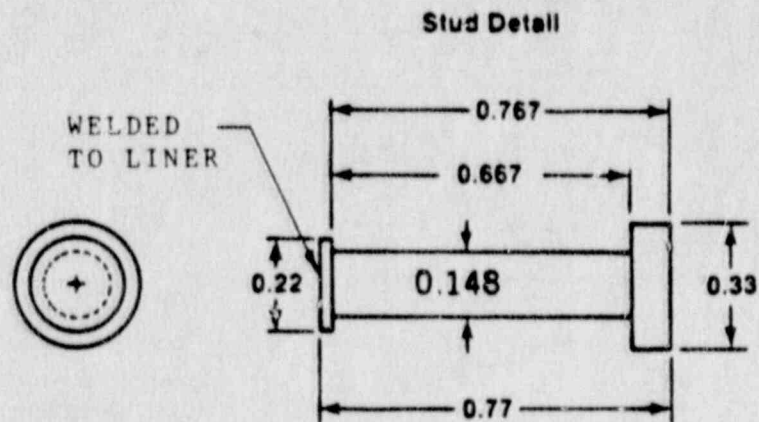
Dimensions of a Typical Stud Anchor Used Near the Midheight of the Cylinder
